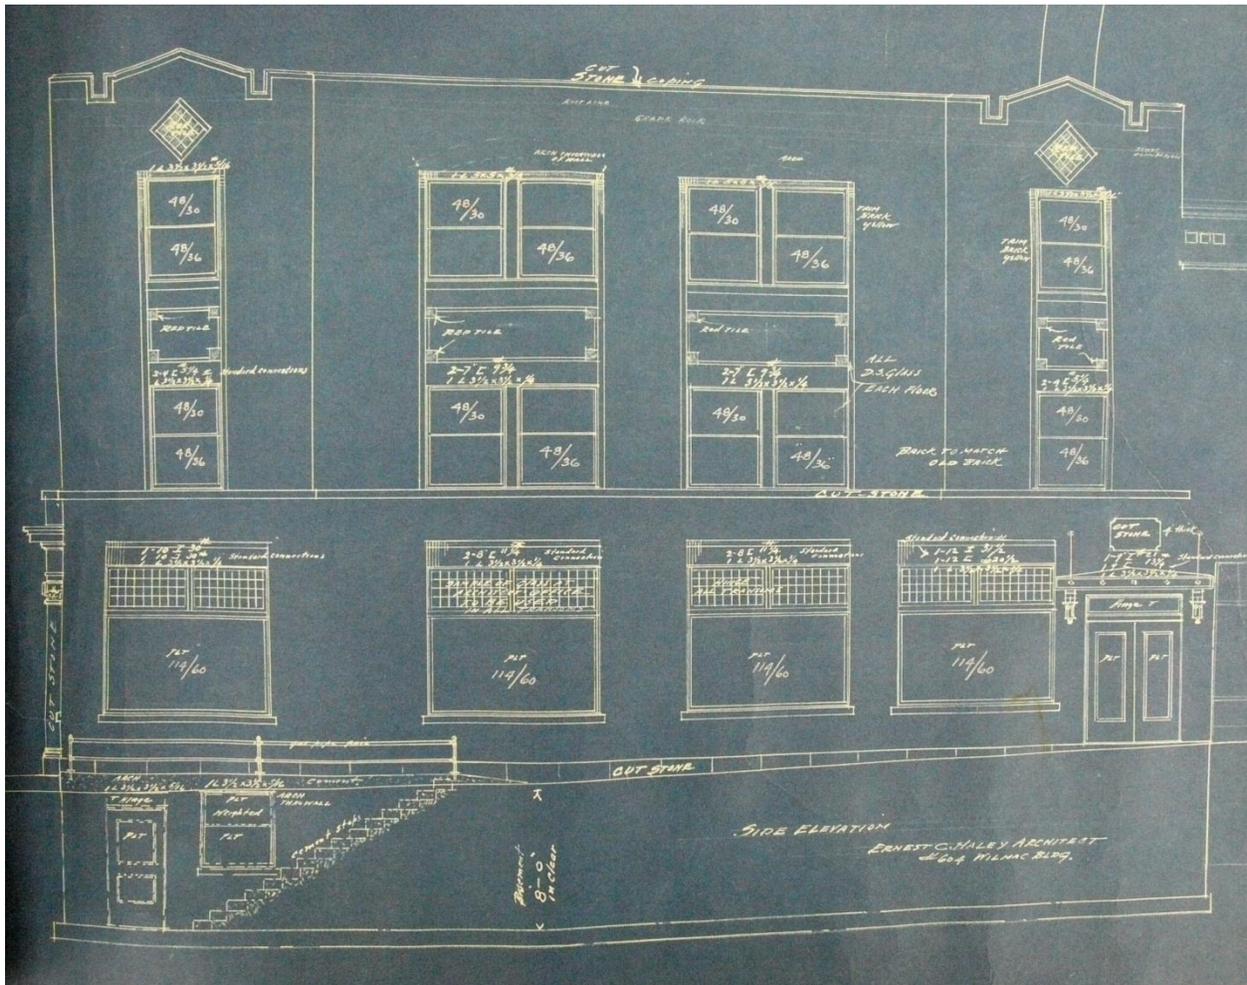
42<sup>nd</sup> Avenue North elevation, source: Northwest Architectural Archives
